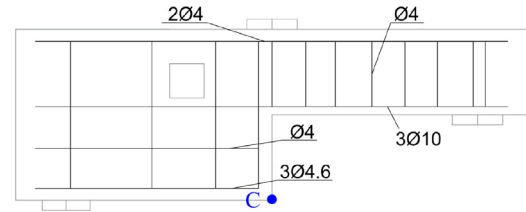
Reinforcement layout of specimen A in Oviedo et al. [47] (mm).
